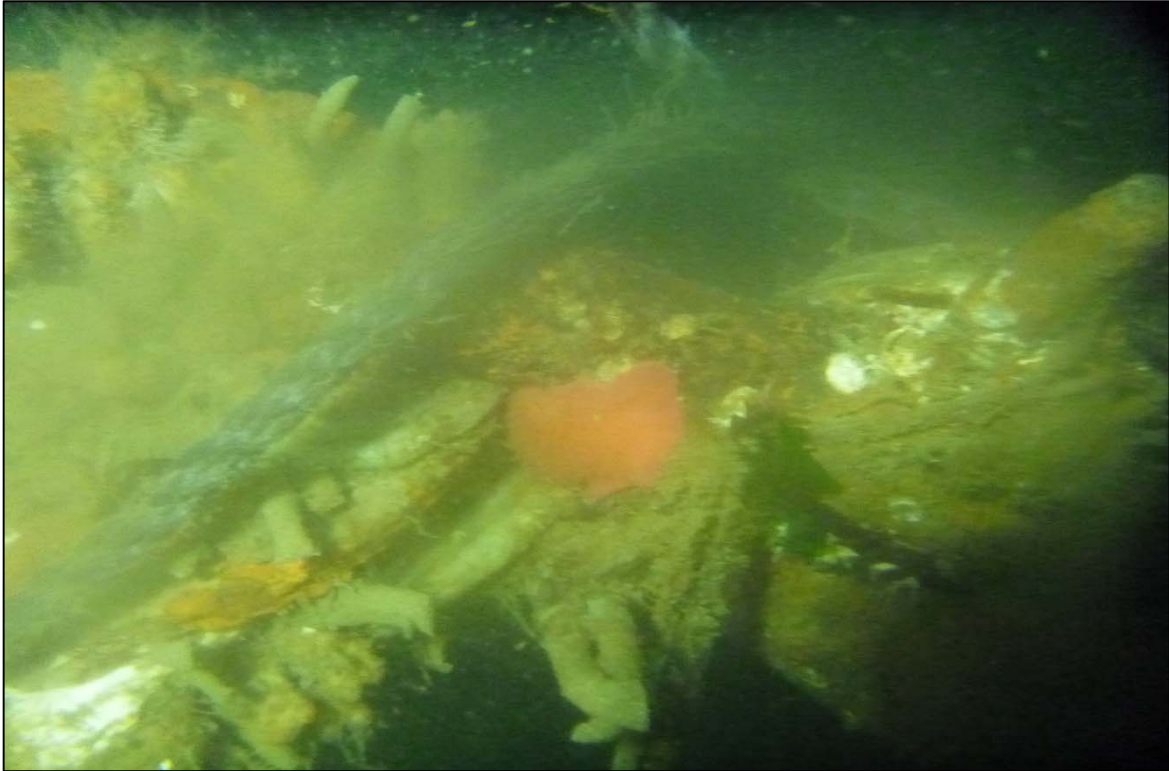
View of Lower Anchor Chain to Anchor Rope Connection with Heavy Barnacle Growth (Thimble) at Site 3 Anchor Line 21, Looking Northeast.
